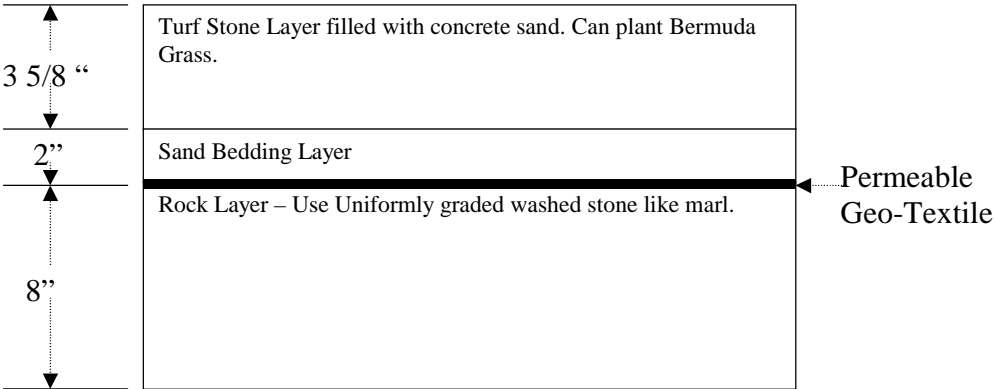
Cross-section of pavement used at Hannibal Parking Lot in Kinston, NC.
